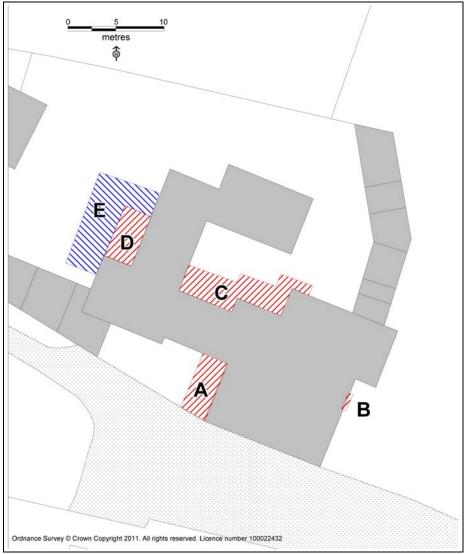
Layout of building as shown on modern OS maps, but not accurately mapped. Refer to plan with planning application, copyright of Sarnau Design of Laugharne. The letters refer to parts of the building to be altered as outlined above.
